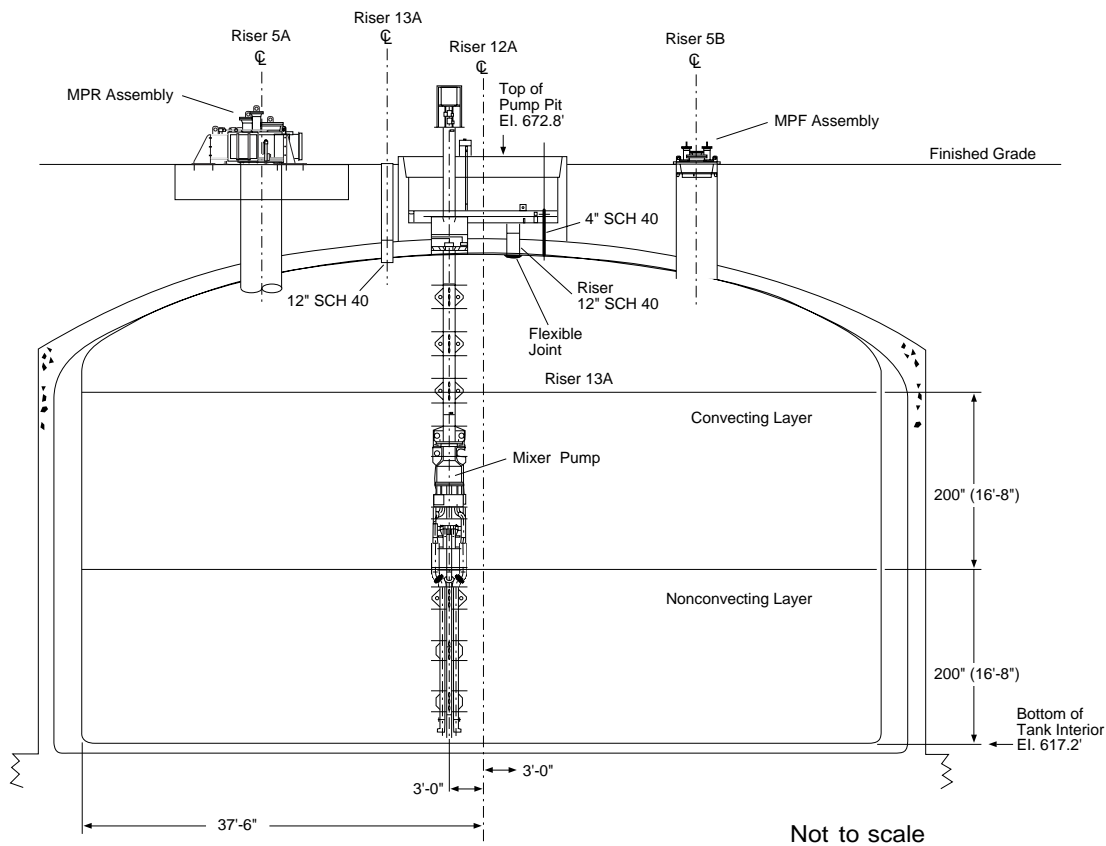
HLW Tank 101-SY cross-sectional view
